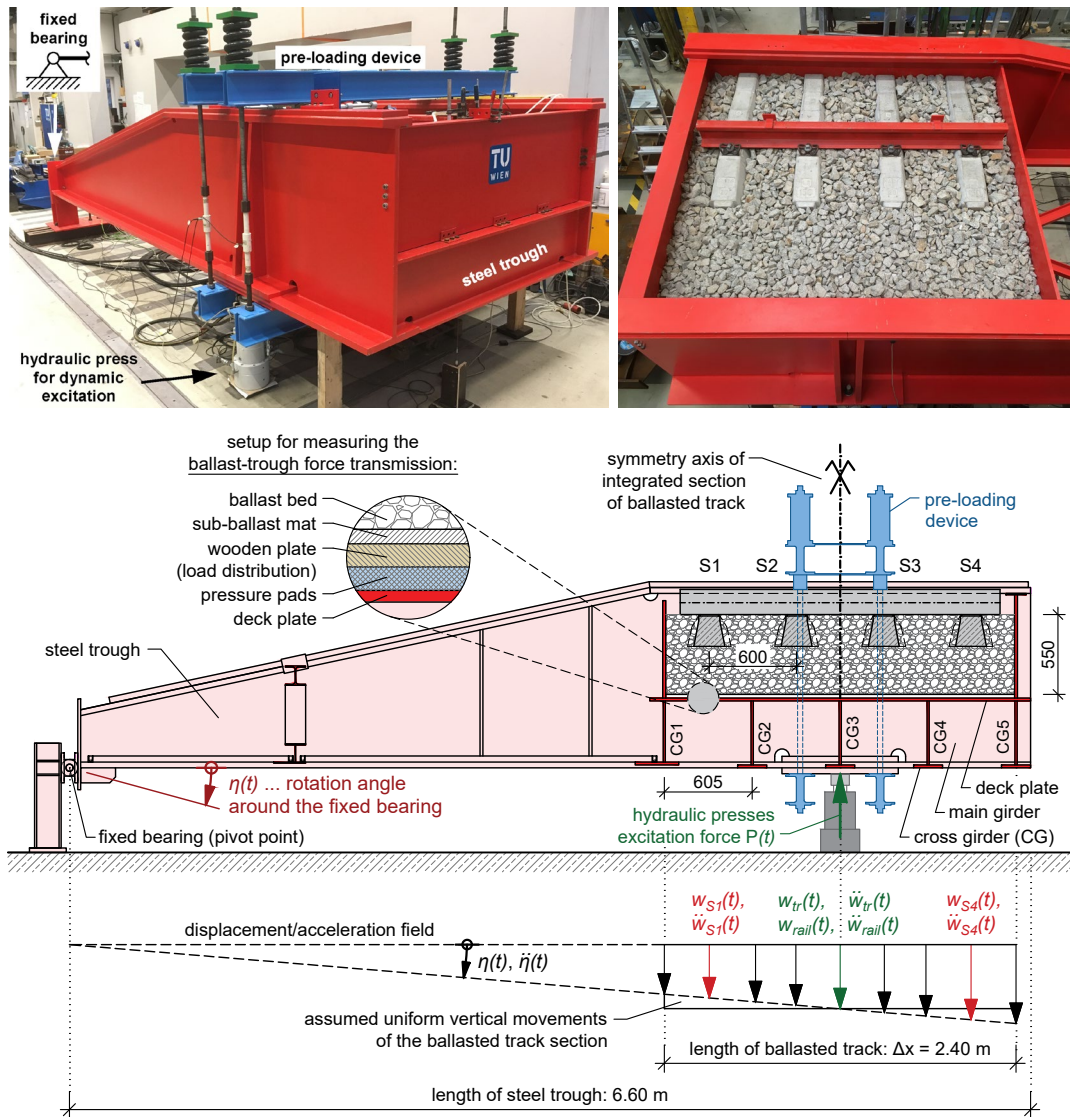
Investigation of vertical track-bridge interaction (TBI) – top left: overview of large-scale test facility – top right: integrated section of ballast superstructure – bottom: longitudinal section.
